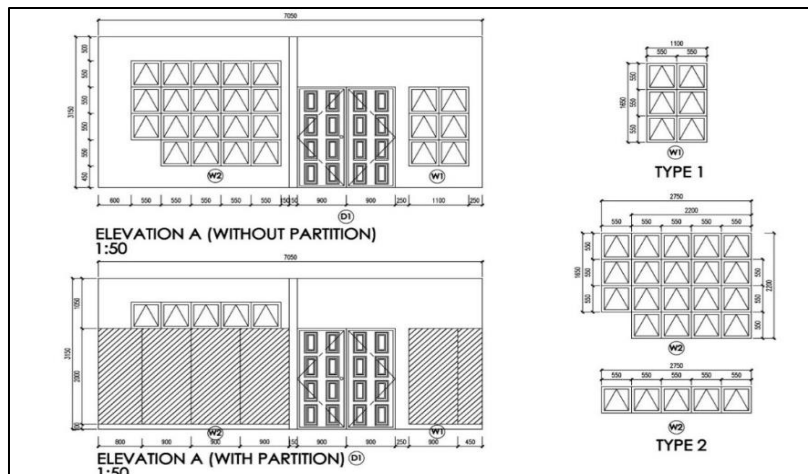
Elevation Drawing and Opening Types Drawing for Model
